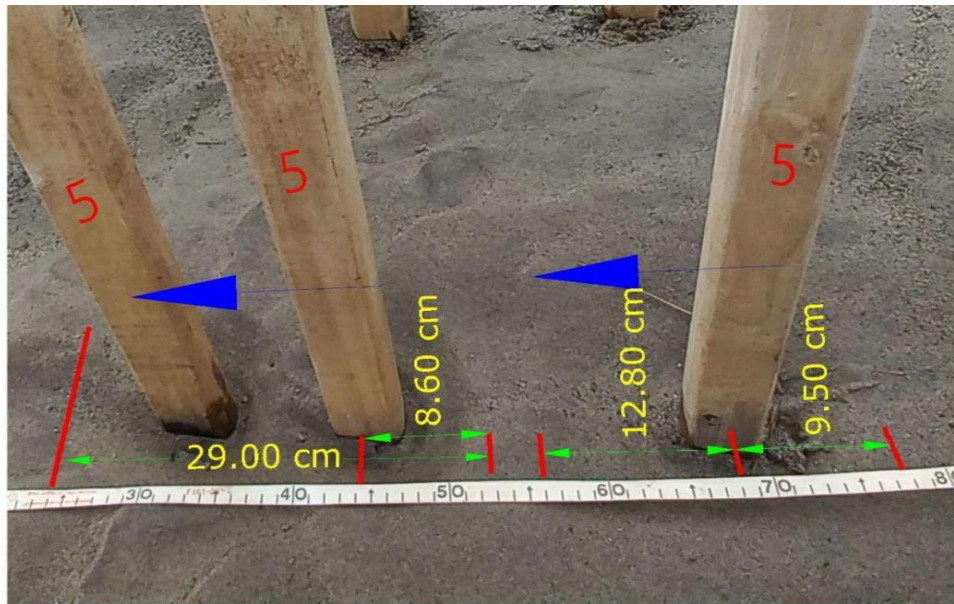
Photo of scour hole around pier no. 5 of bridge near Guwahati
